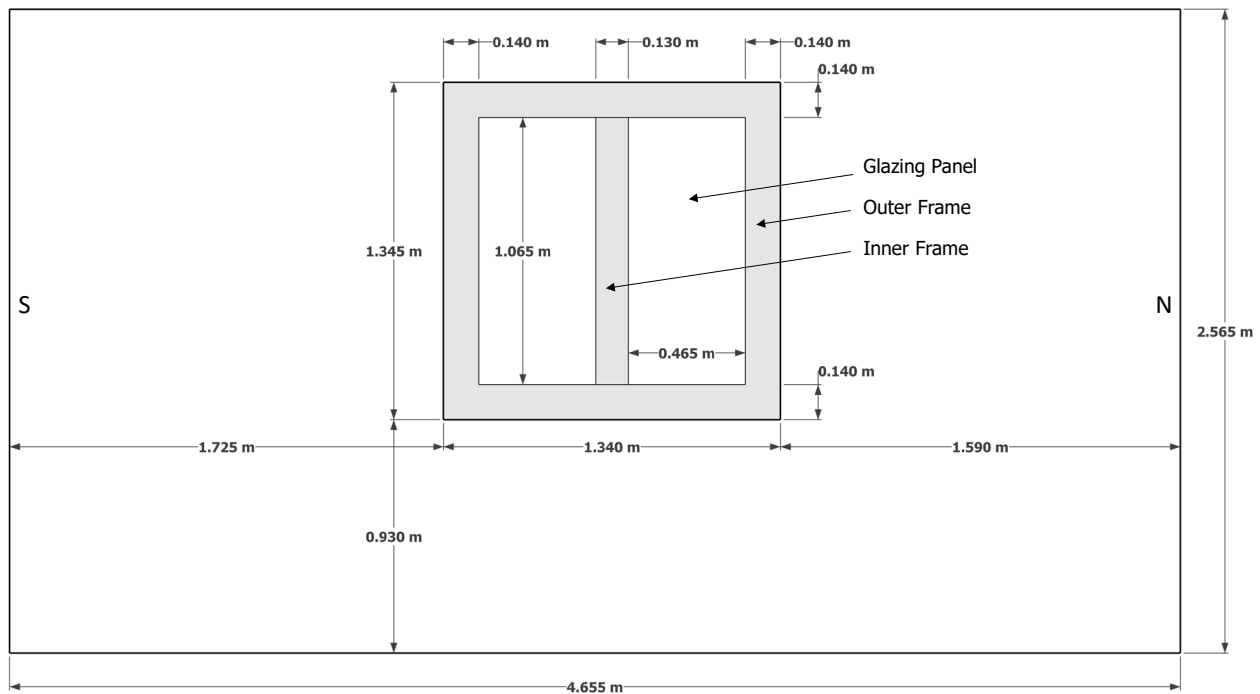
Cell A dimensioned east wall with window elevation, exterior view
